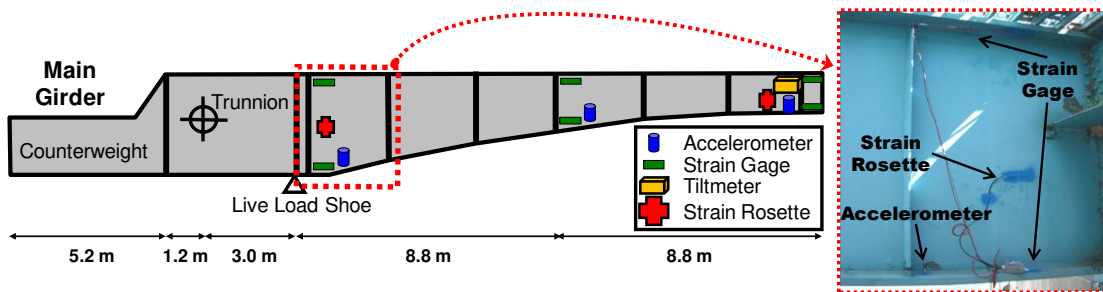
Sunrise Boulevard Bridge main girder and sensor locations
